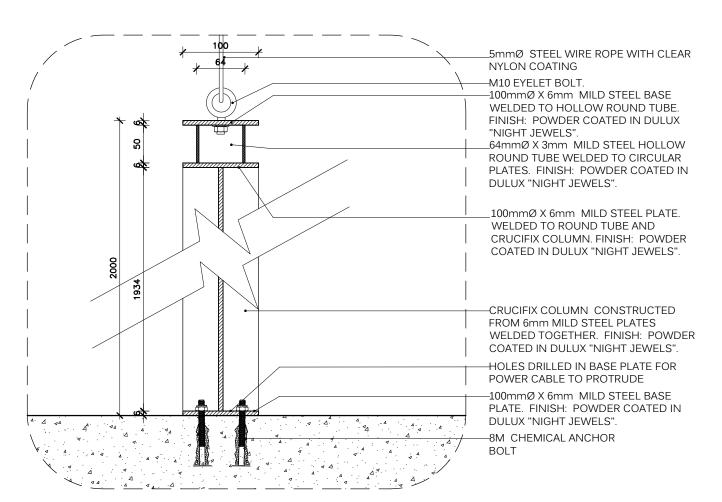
SECTION INFORMATION POLE DETAIL SCALE 1:5
